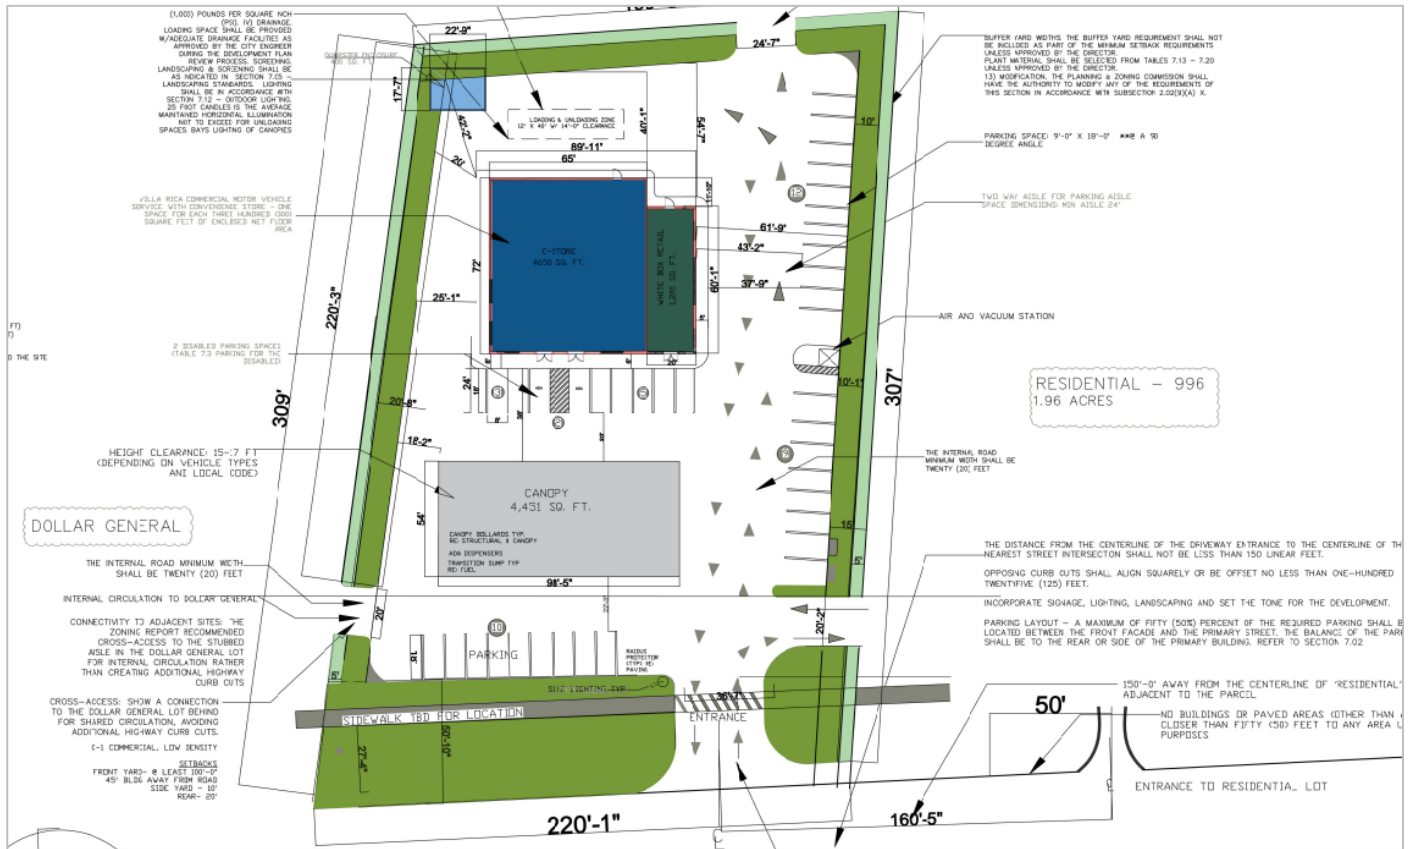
SITE PLAN. 974 DALLAS HWY.
